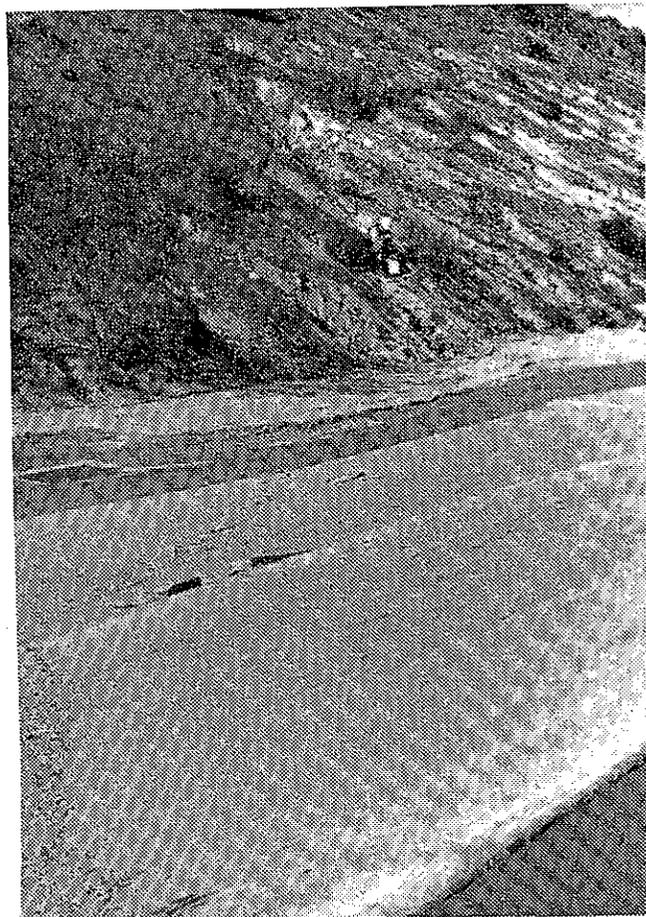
Looking westerly across truck lane pavement. Fault trace extended up cut slope in background.
